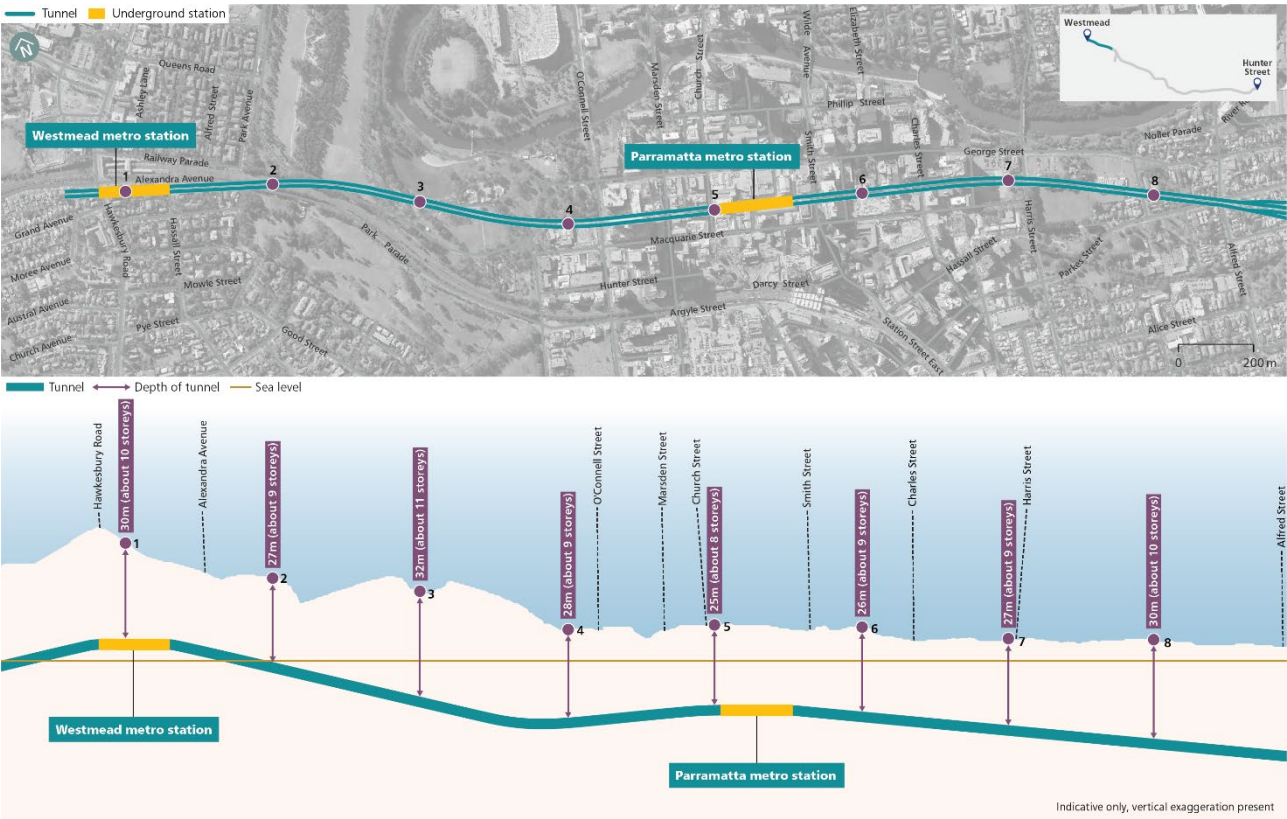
Indicative alignment plan and long section (1 of 8)
